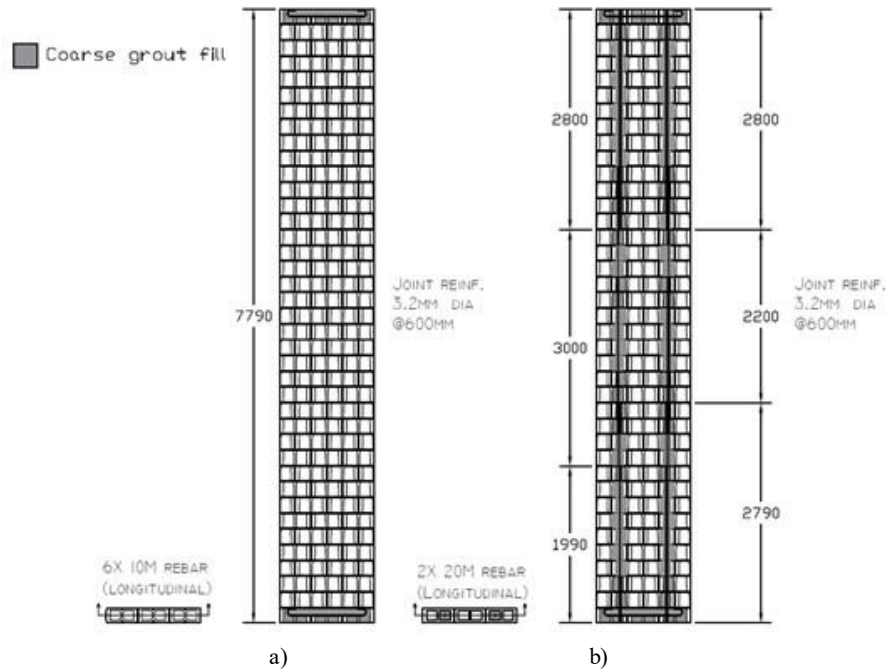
Grouted reinforcement placement: a) Walls NH7800a and NH7800b; and b) Walls CH7800a and CH7800b
